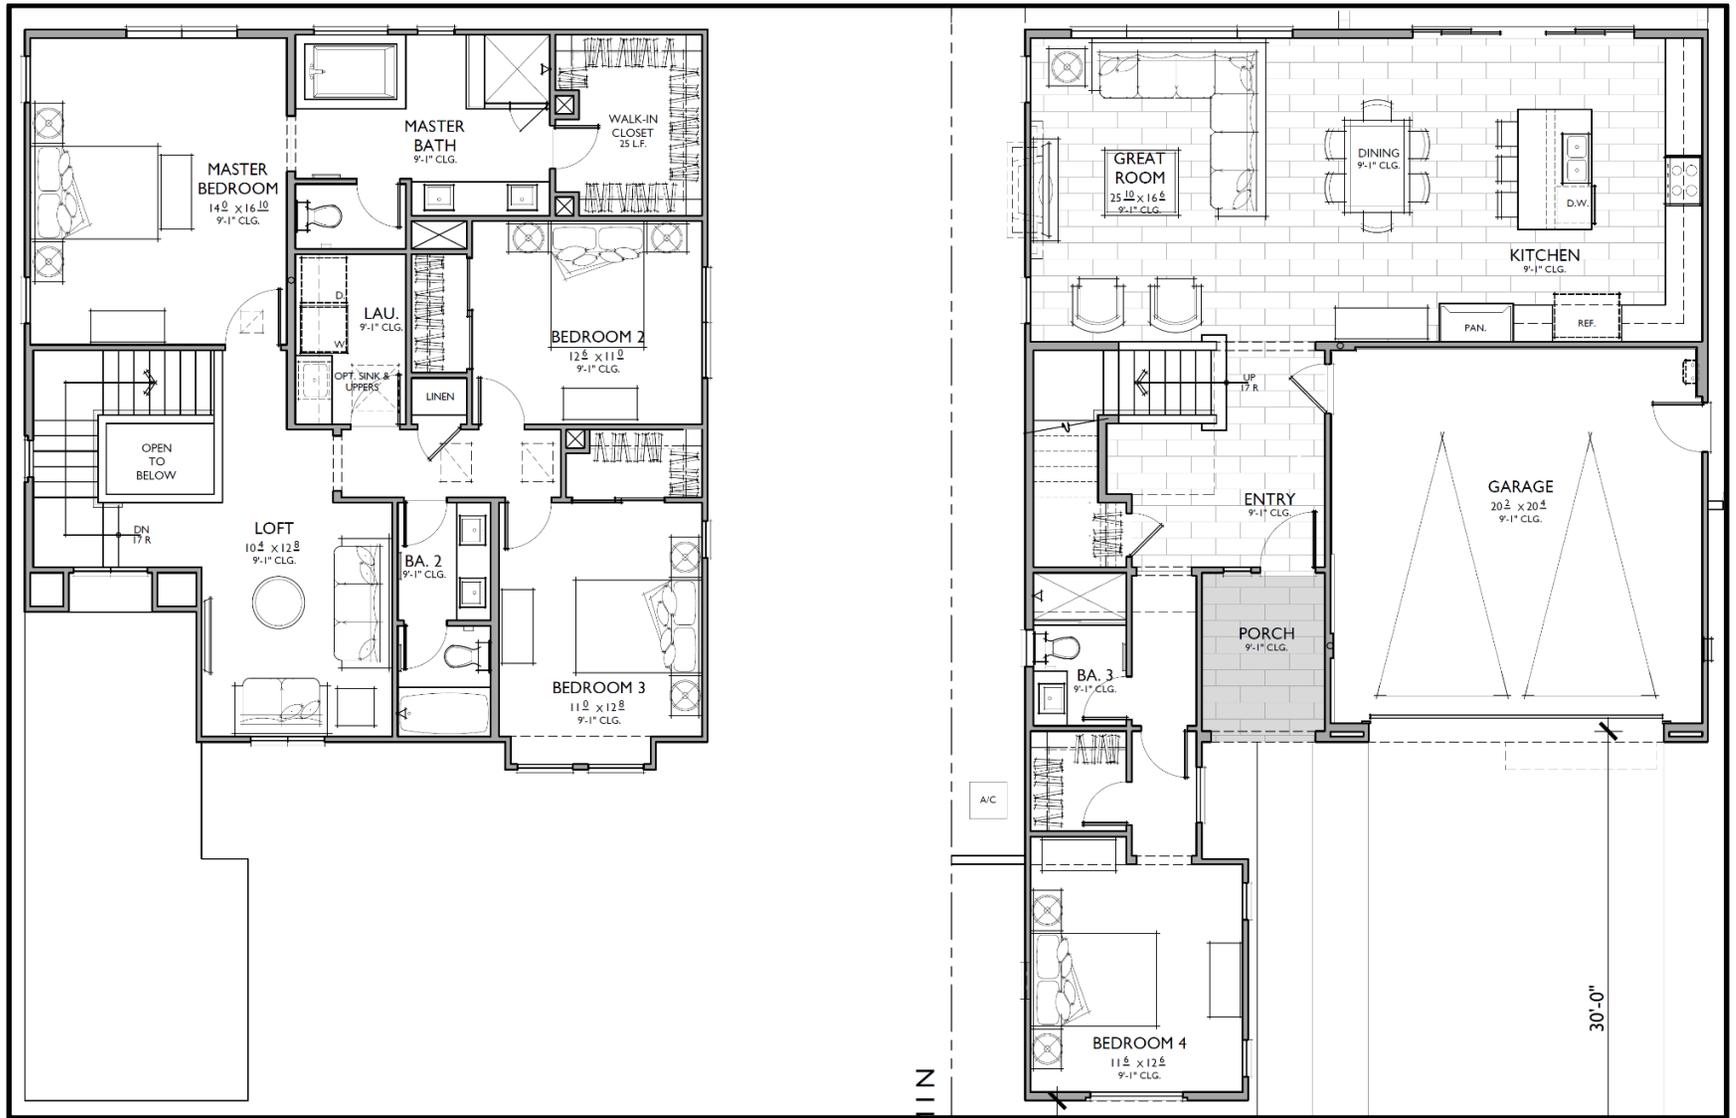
Exhibit B — FLOOR PLAN AND EXTERIOR ELEVATIONS — PLAN 1
